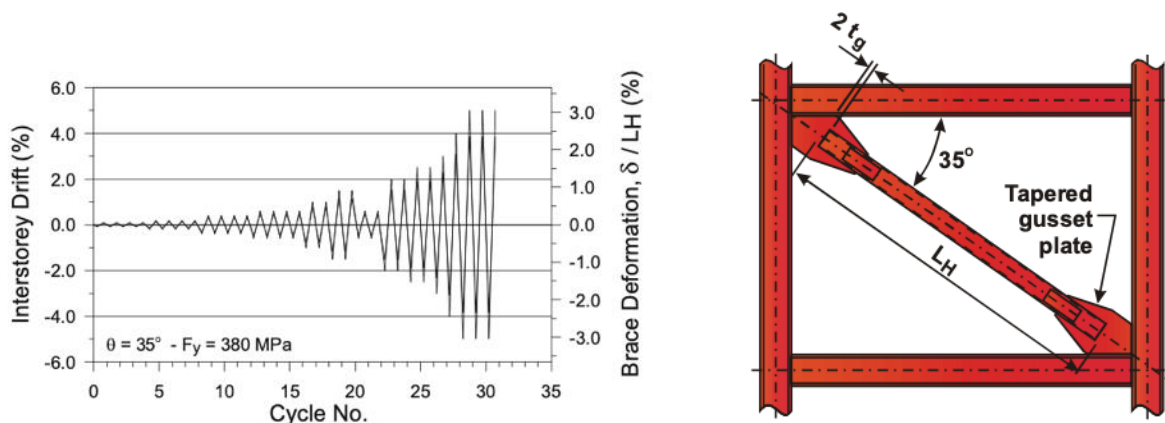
Loading Protocol and Assumed Brace Geometry
